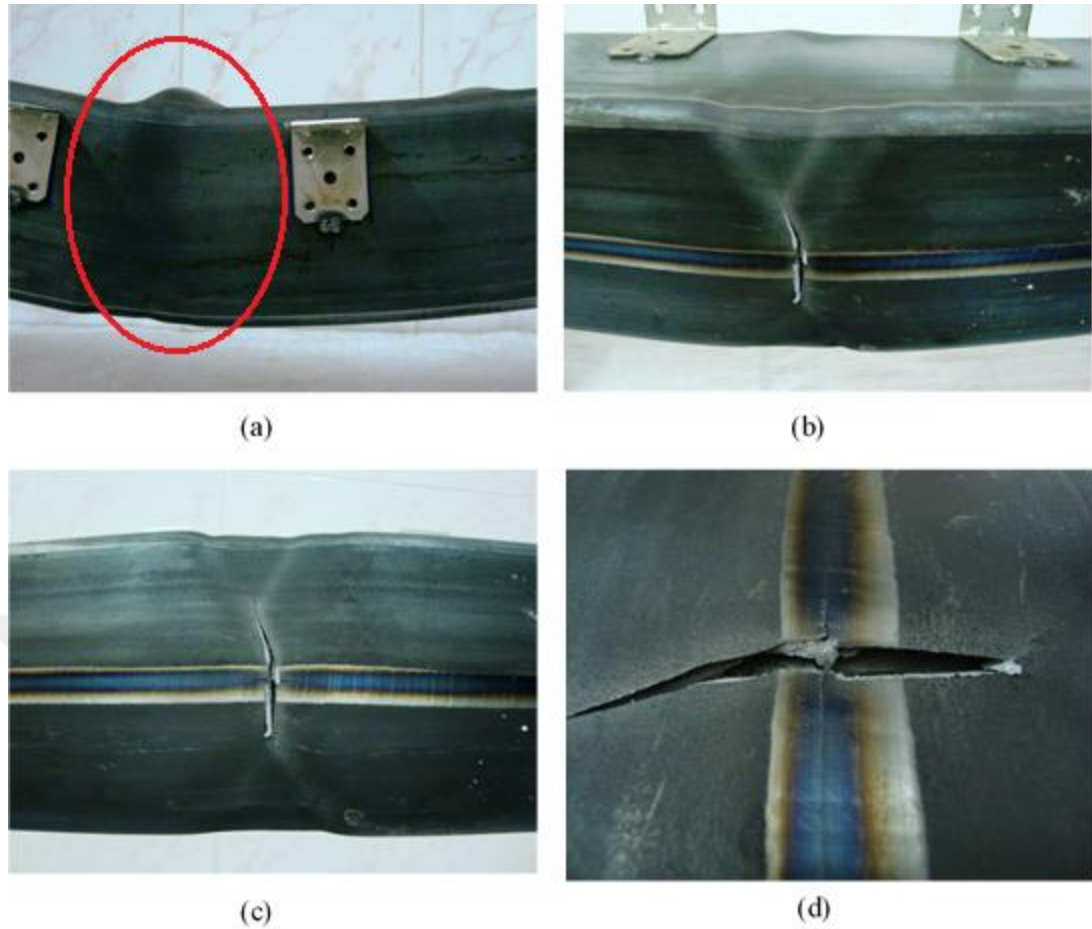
Typical tensile fractures on the bottom flange
